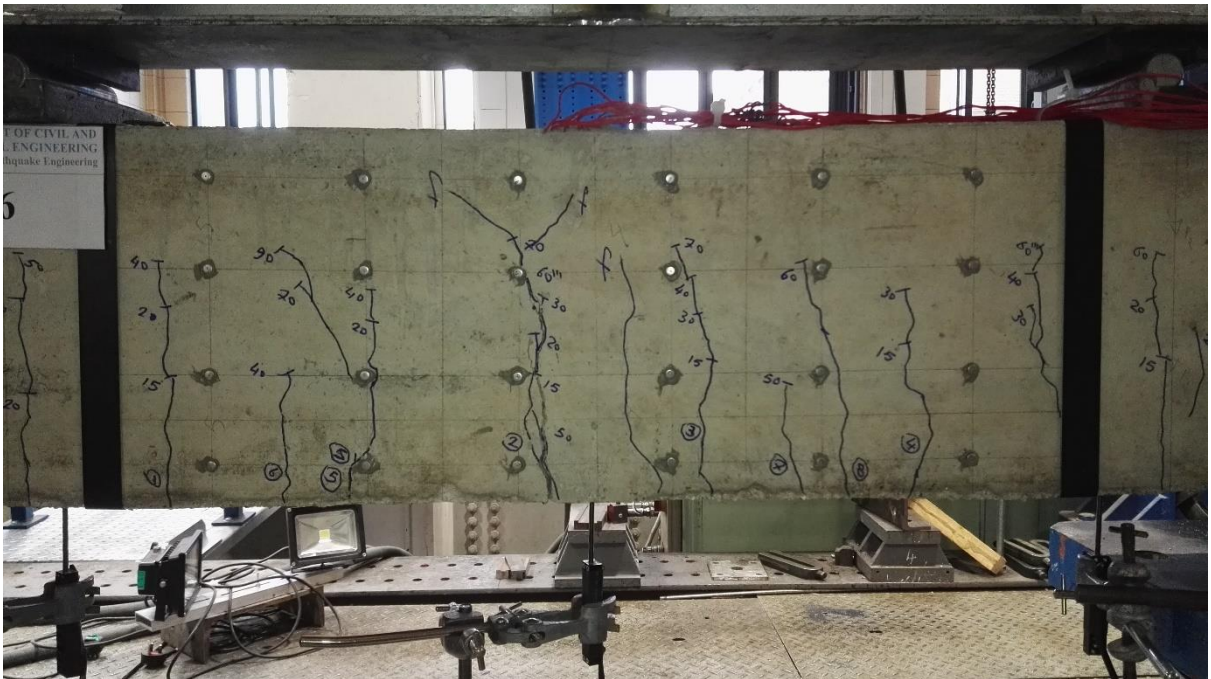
Final cracking pattern in constant moment zone in beam B3016.
